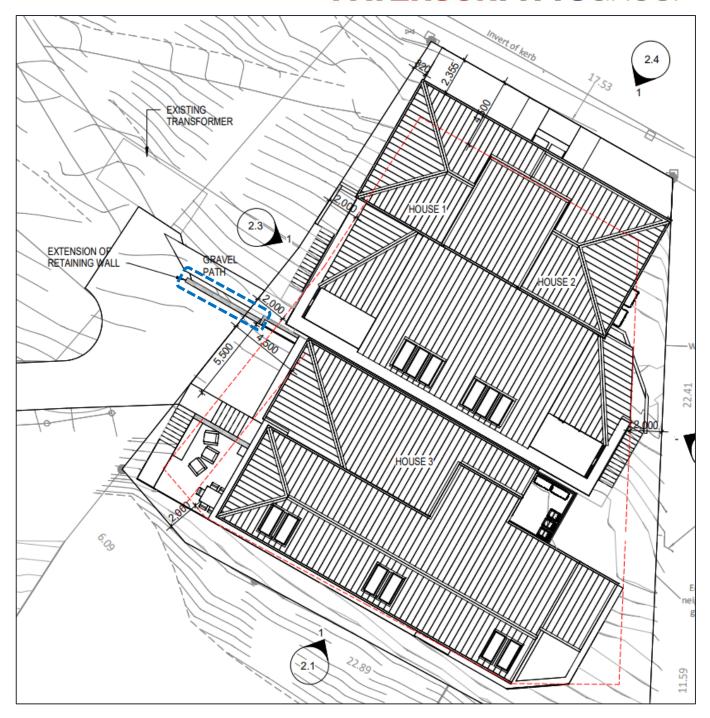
Plan View of the proposed retaining wall within Tramore Street (dashed blue line)
